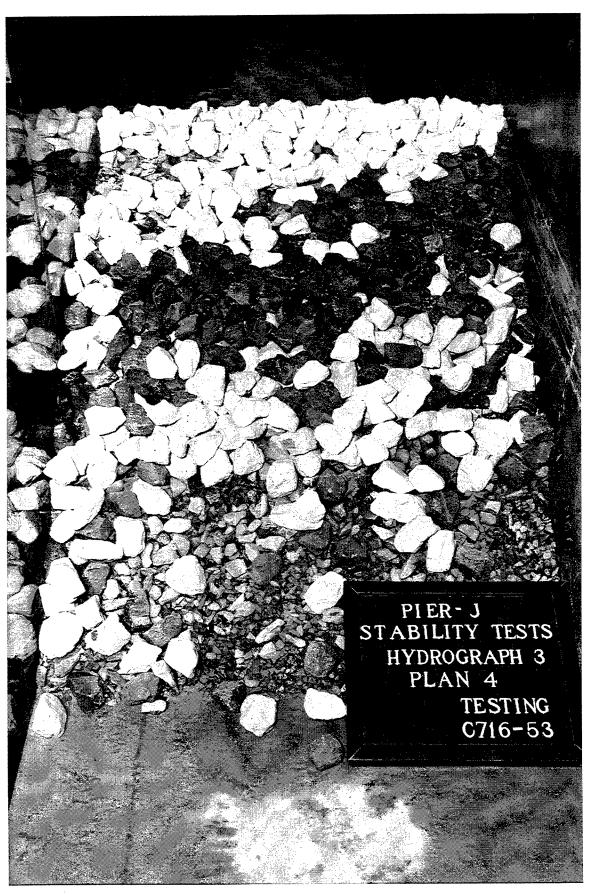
Harbor-side view of Plan 4 after testing step 15 of Hydrograph 3
